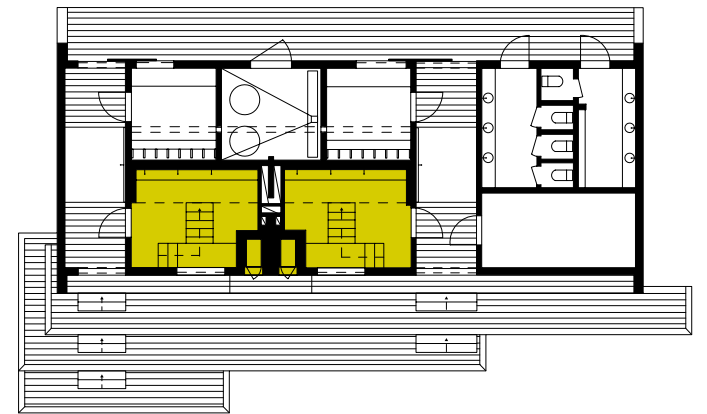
Floorplan. Illustration by author from <https://www.archdaily.com/873054/lonna-sauna-oopeaa>.
